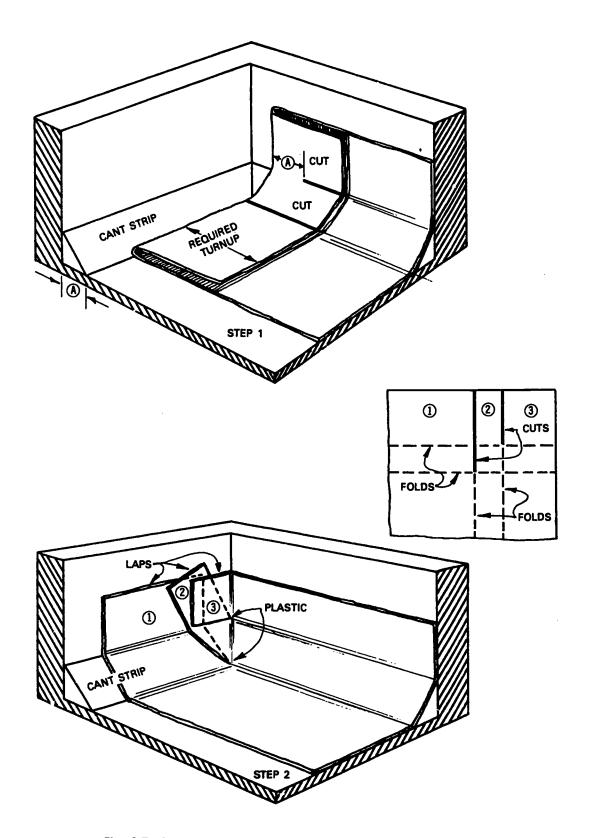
Cutting and folding an inside corner with a cant strip
